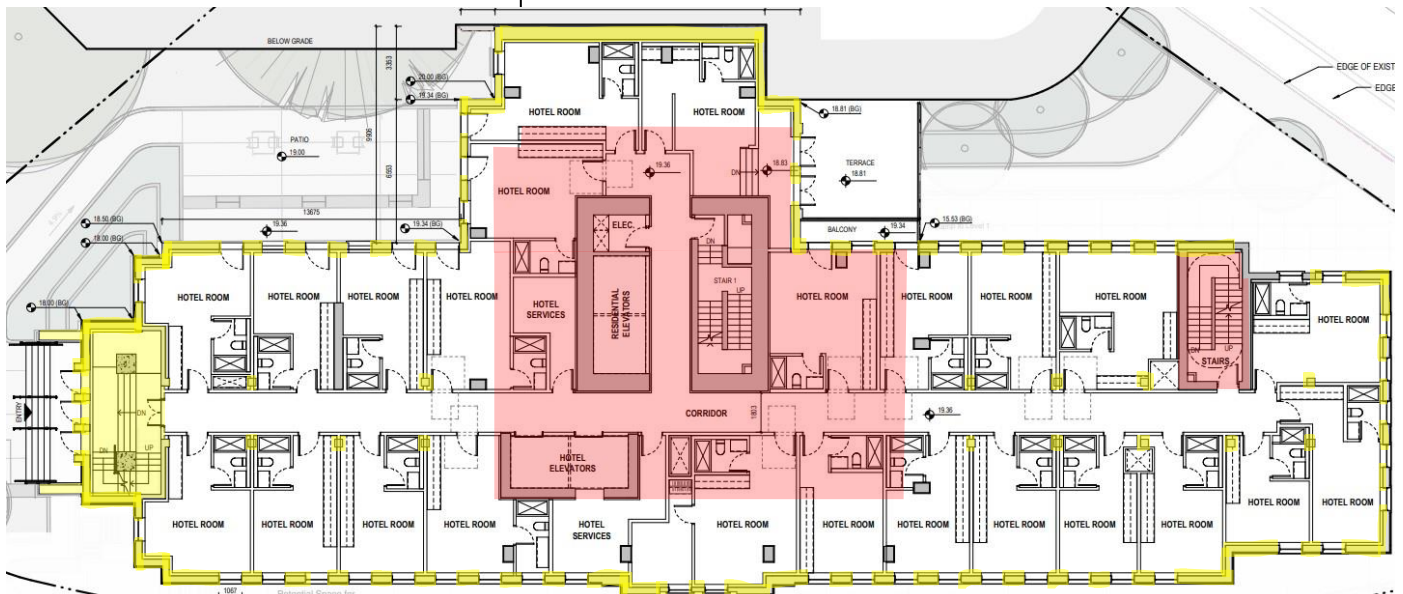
Proposed Level 2 Floor Plan. Retention of building and structure. The west entrance and closed stair retaining walls and vertical pilasters will be restored to their original appearance with dark marble cladding. The interior west stair will be preserved and restored. Internal configuration is relatively maintained. Source: omb Architects + Designers architectural drawings, February 17, 2023.
